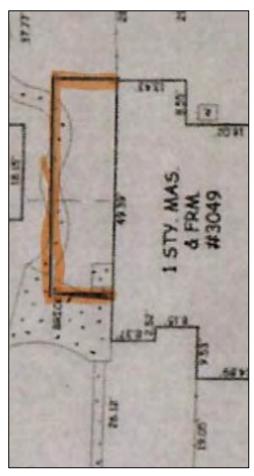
Section of survey with proposed location of porch highlighted, from application materials
